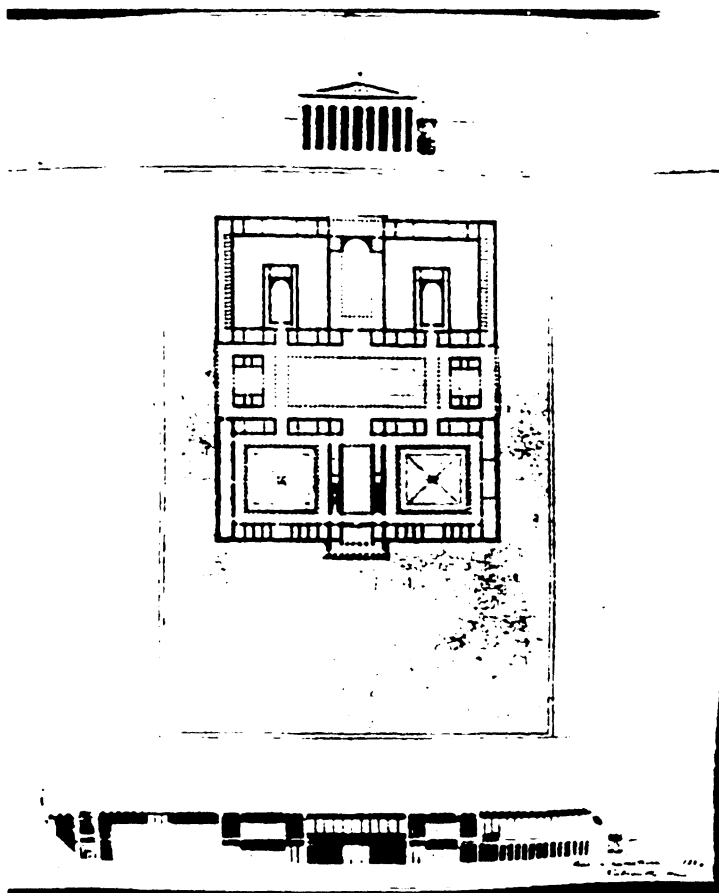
Henri Labrouste. Cour de Cassation, 1824, sketch elevation, plan and section.
